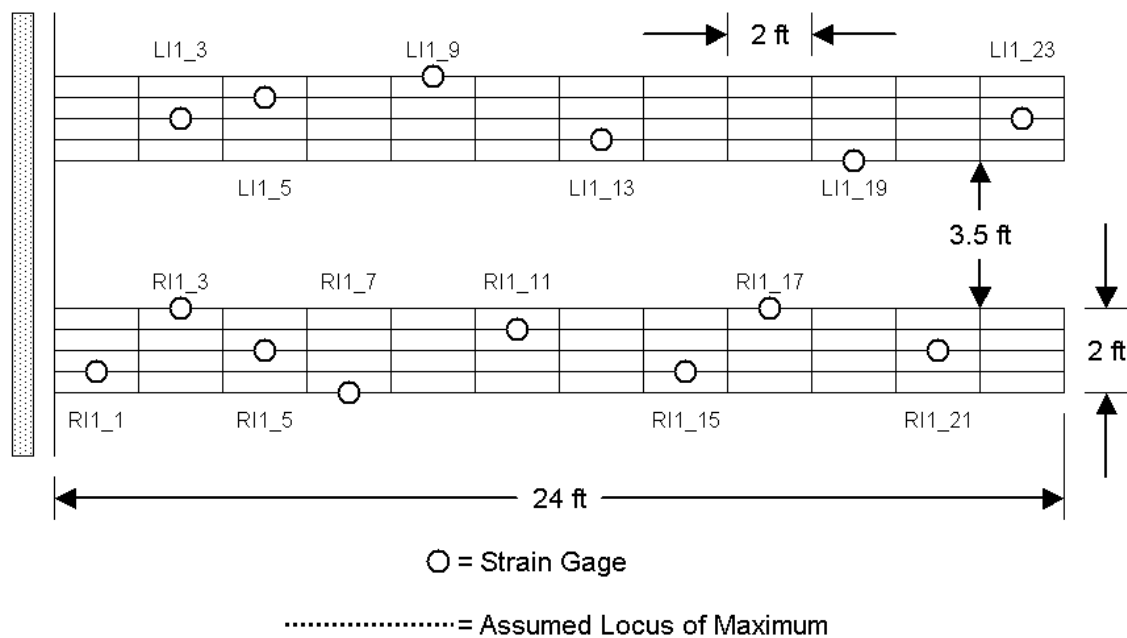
Plan view of instrumented primary bar mat IL1 at level 1 located in the intermediate and primary reinforced section.
